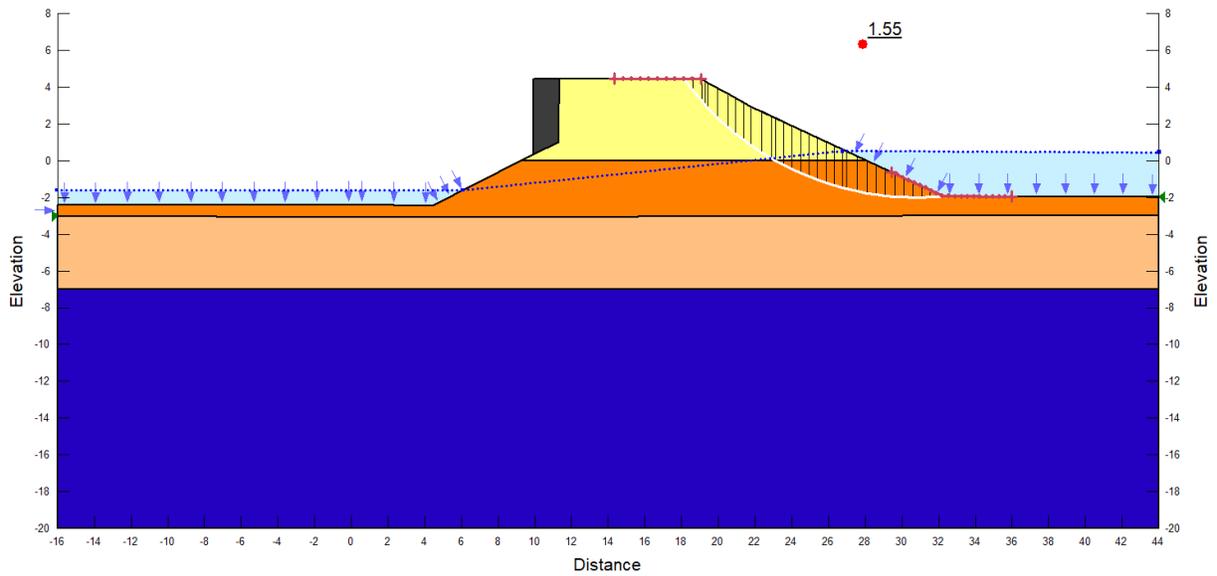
Riverward stability of dike at pump station after raising to El. +4.4 m.
